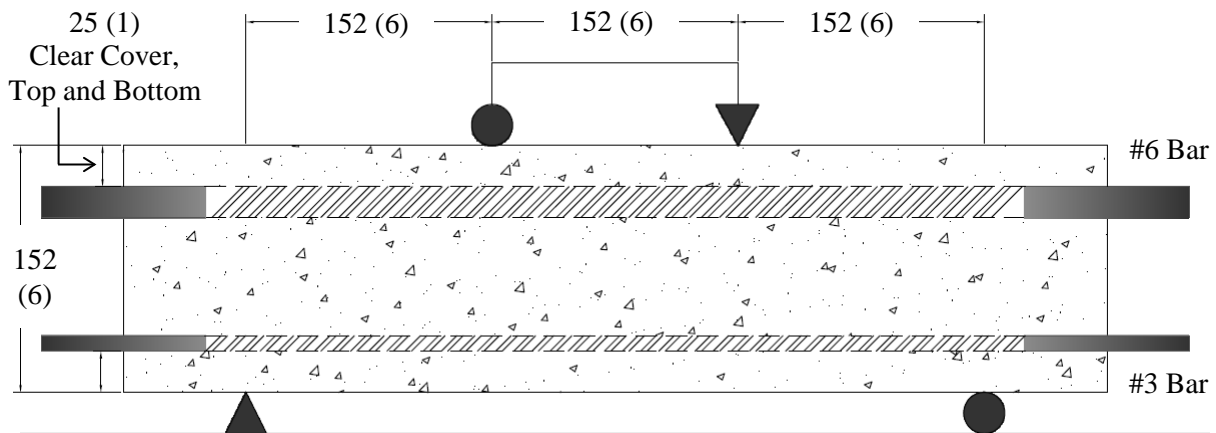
Reinforced Concrete Beam 4-Point Bending Test Dimensions, mm (inches)
